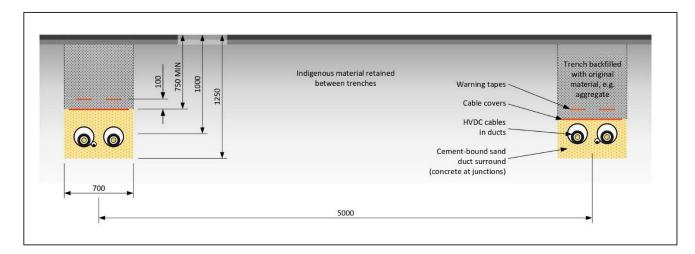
Typical Arrangement of HVDC Cable in Road, Verges and Footpath
